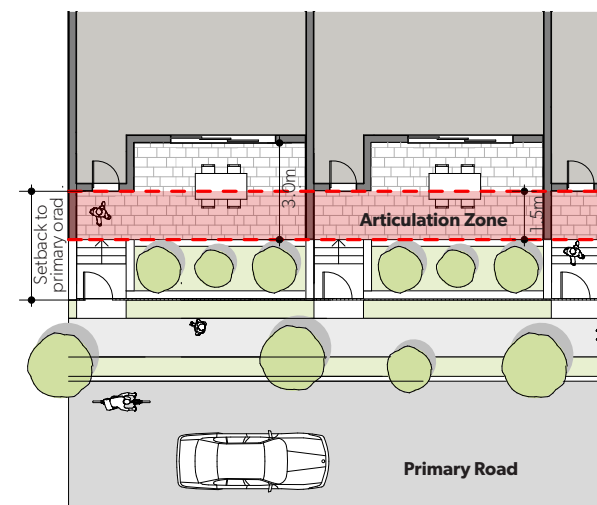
Private open space facing the street sits within the articulation zone or behind the front building line. It is separated from the street by landscaping and may include low fences.
